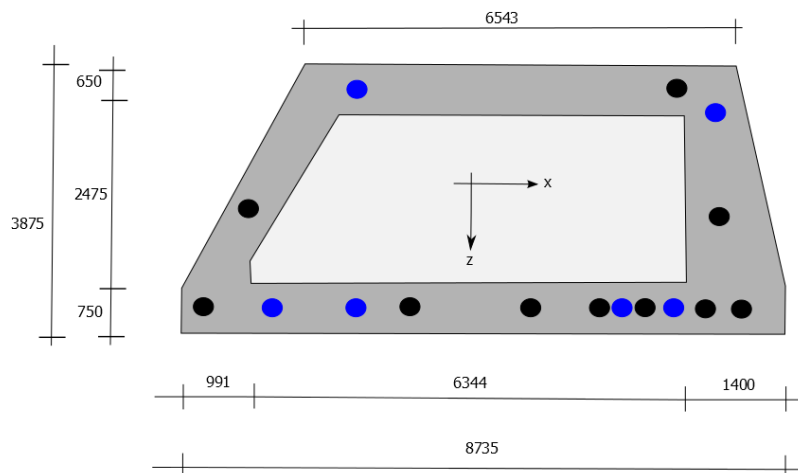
Cross-section sill beam (middle) – Positions prestressed tendons
